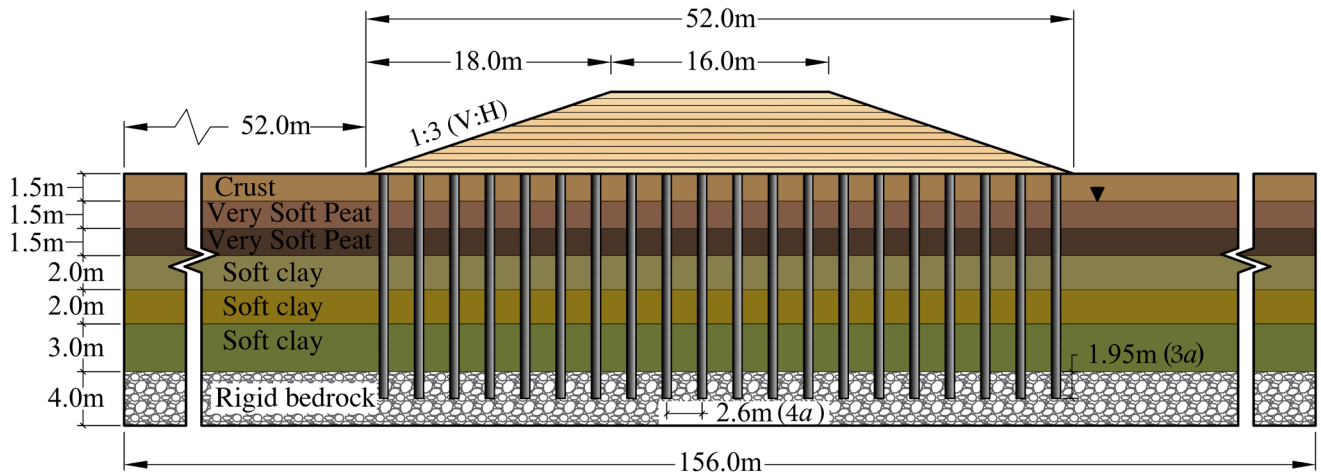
Considered numerical full-scale embankment model and sub-soil sample
